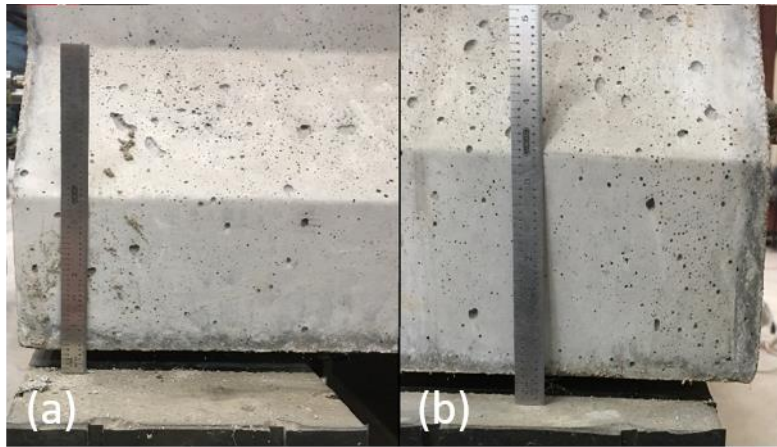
Girder A3 raised off of supports at (a) the east support and (b) the west support
